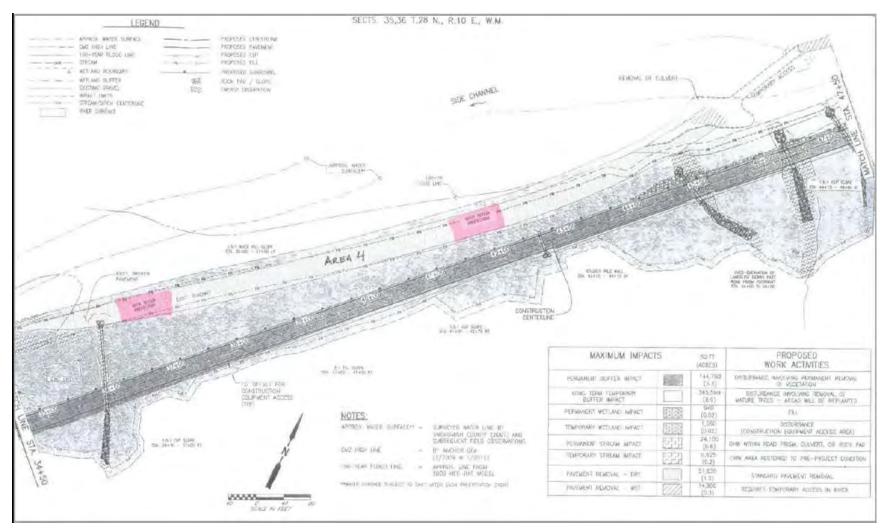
Roadway section plan sheet with details, including buried rock revetment (Snohomish County Public Works 2015, Appendix D)
